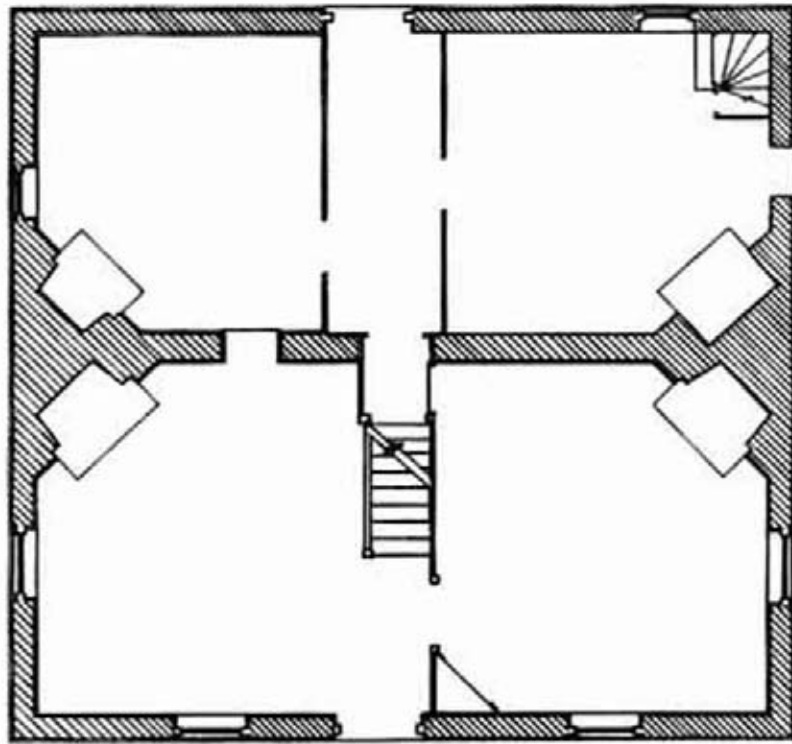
The Reward Floor Plan. Plan, Michael Bourne.
